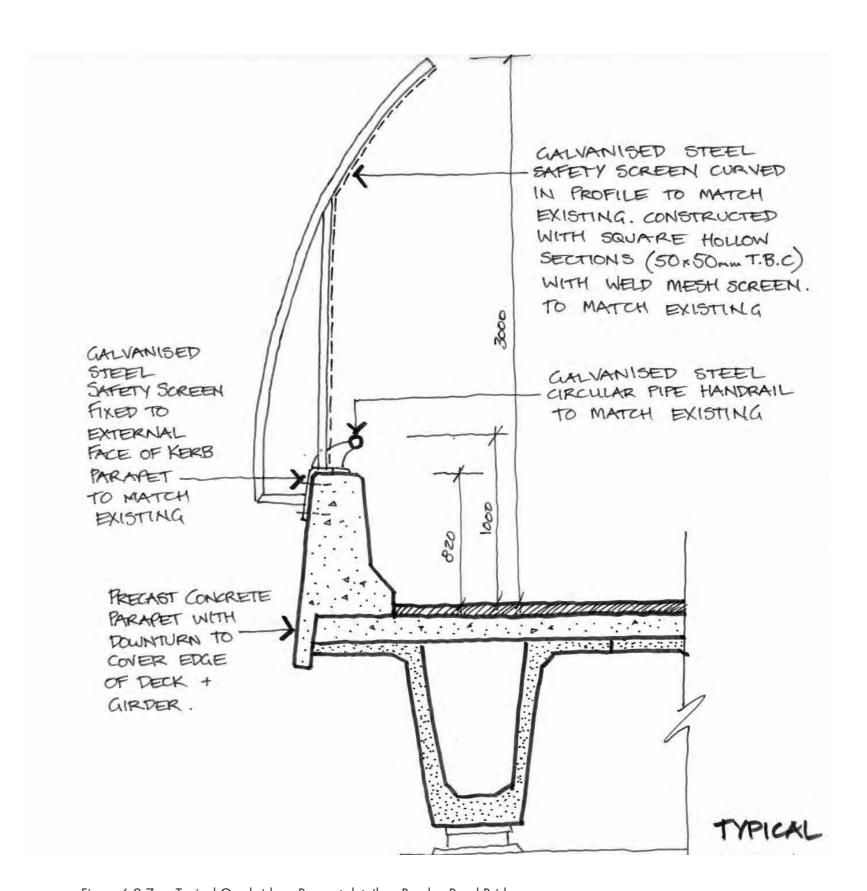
Typical Overbridge - Parapet detail on Barclay Road Bridge
